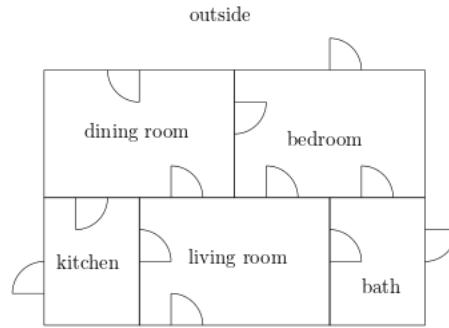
The floor plan of a ground floor apartment, its rooms, and the various doors connecting each of the rooms.
